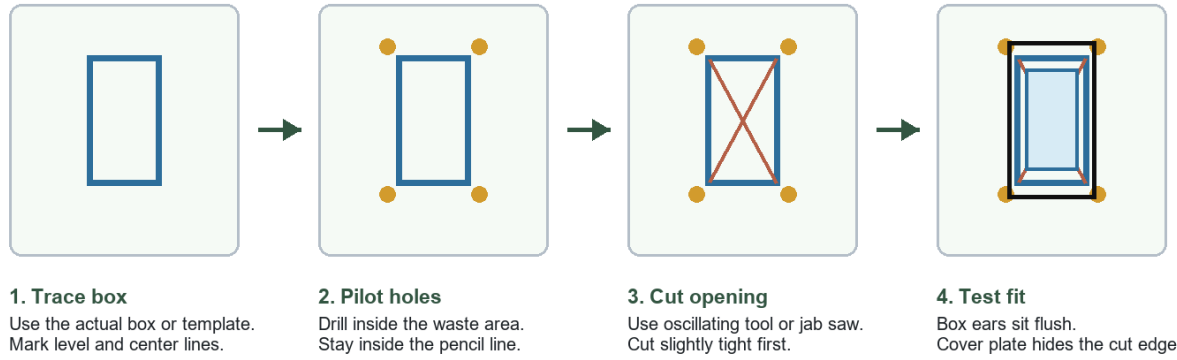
Cut slightly inside the line first. A tight opening can be trimmed; an oversized opening is hard to hide.
